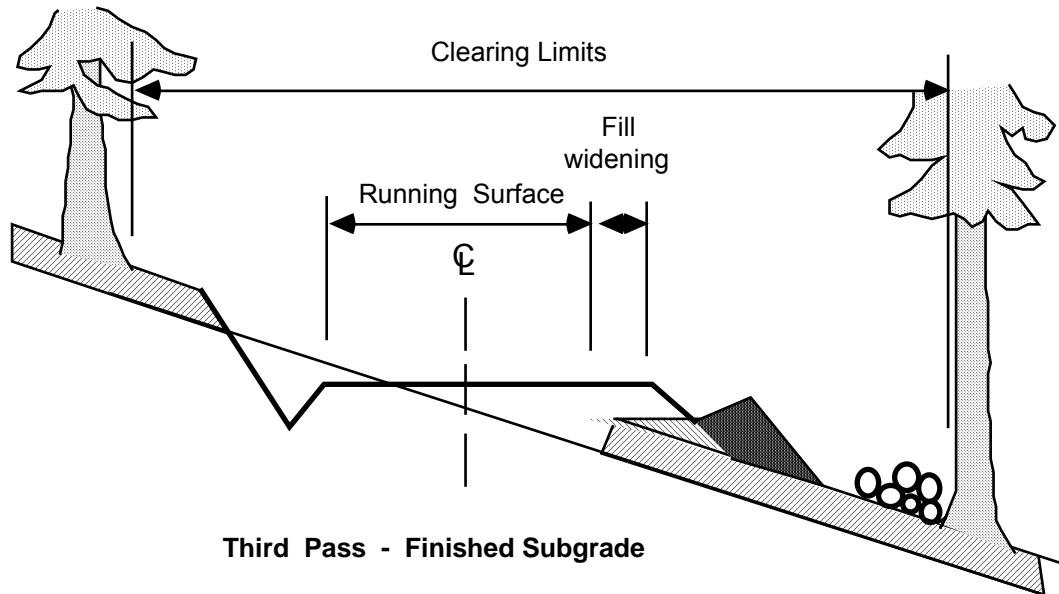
Third pass, finishing subgrade and embankment fill over pioneer road. Road side ditch is finished at the same time.
